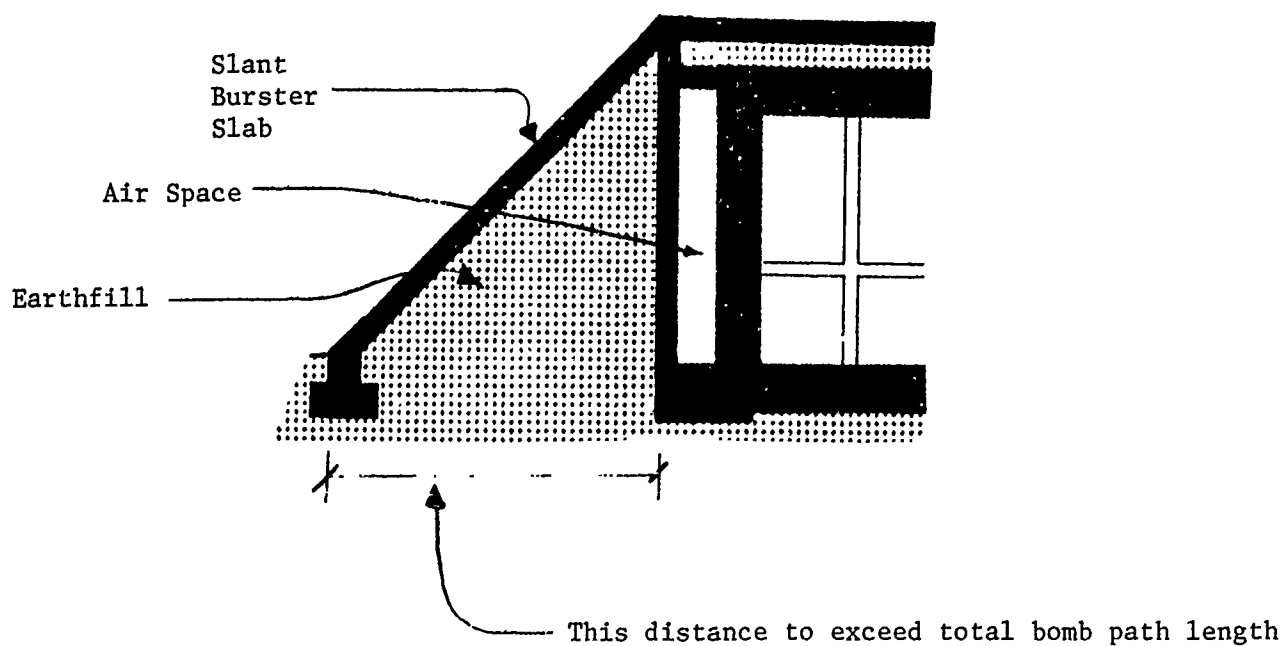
Slant Wall Burster Slab Typical for Aboveground Structures
